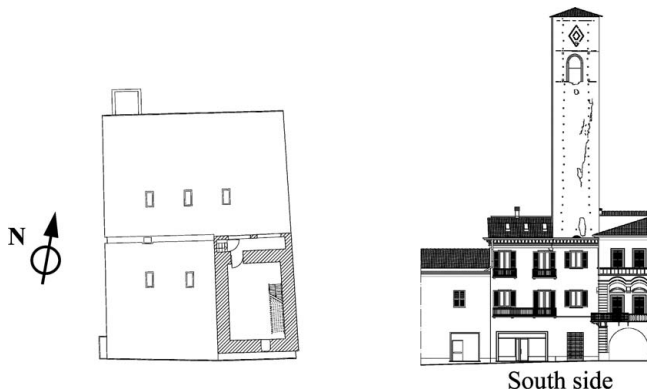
Torre Astesiano. Plan and elevation view of the tower. Notice the presence of the main crack in the upper part of the tower.
